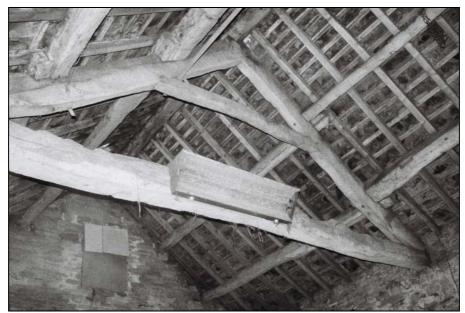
, 25: view of the original oak roof truss (2), looking southeast
